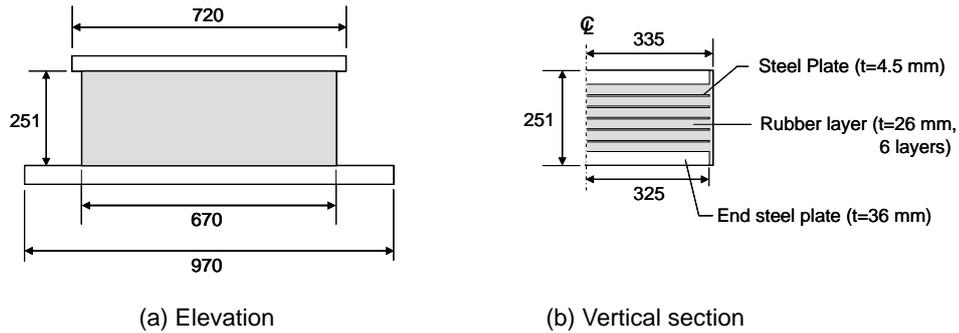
Schematic Drawings of the Bearing of this Study (units: mm)
